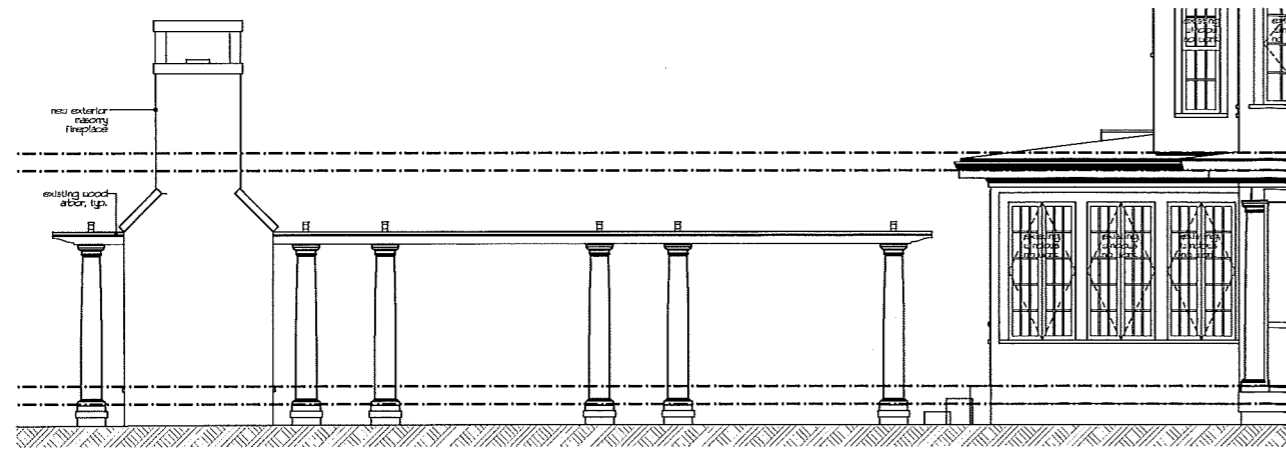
DETAILS OF APPROVED PROJECT: New masonry fireplace with chimney will be added between existing columns of rear yard pergola. Windows within side porch will be modified from a gang of three double hung windows to a new center door flanked by existing windows. On rear inner corner of house, a pair of double hung windows will be replaced by a pair of casement windows in the same opening with the existing trim remaining. See exhibit labeled 'Elevations December 2017'.
